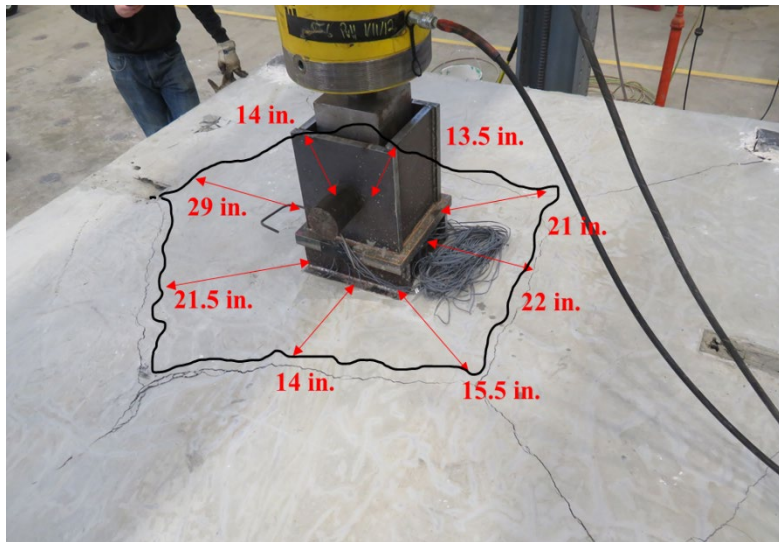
Plan view of cracks formed on concrete surface
